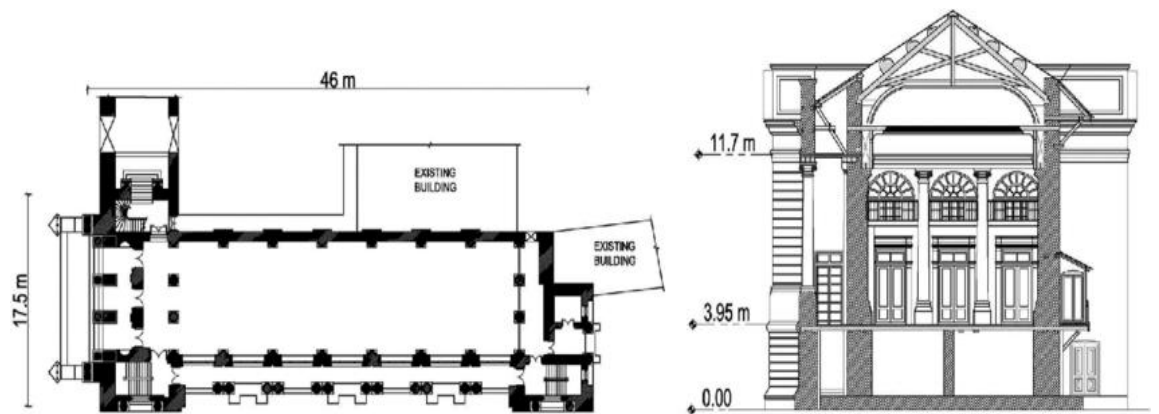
Gaddi Baithak Palace plan (left) and section (right)
